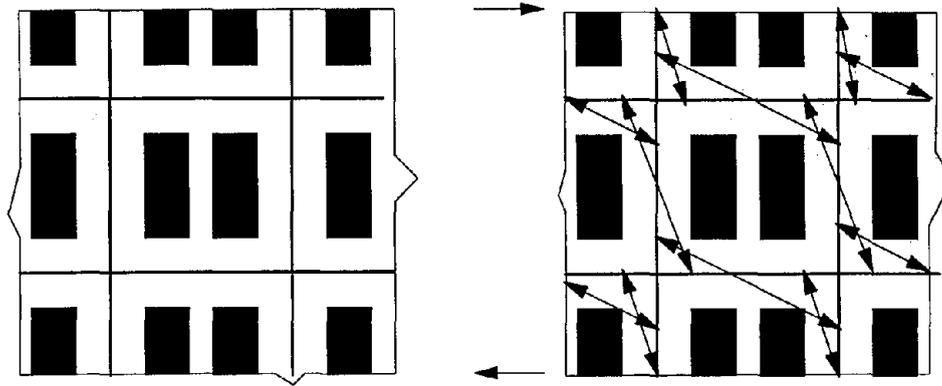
Typical Compressive Fields in Laterally Loaded Penetrated Wall Panel
